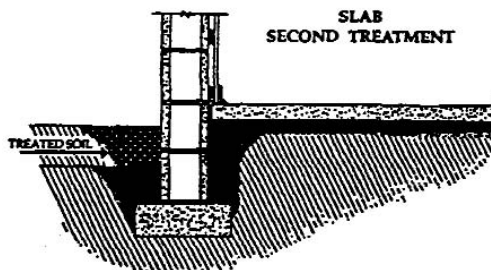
Chemical treatment of the fill material prior to pouring a concrete slab protects wood in the building from termite attack.
